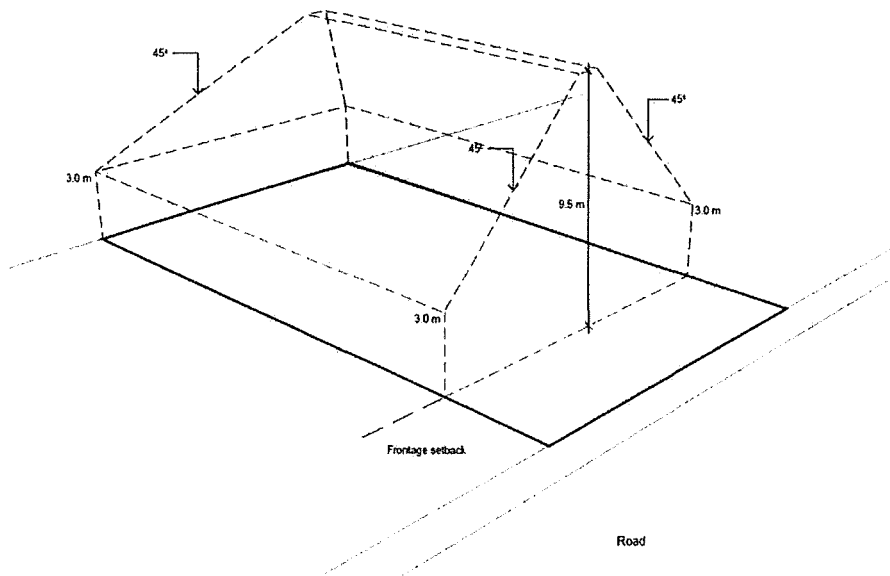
Building envelope as required by clause 9.4.2 A3(a) and clause 9.5.1 A2(a)
